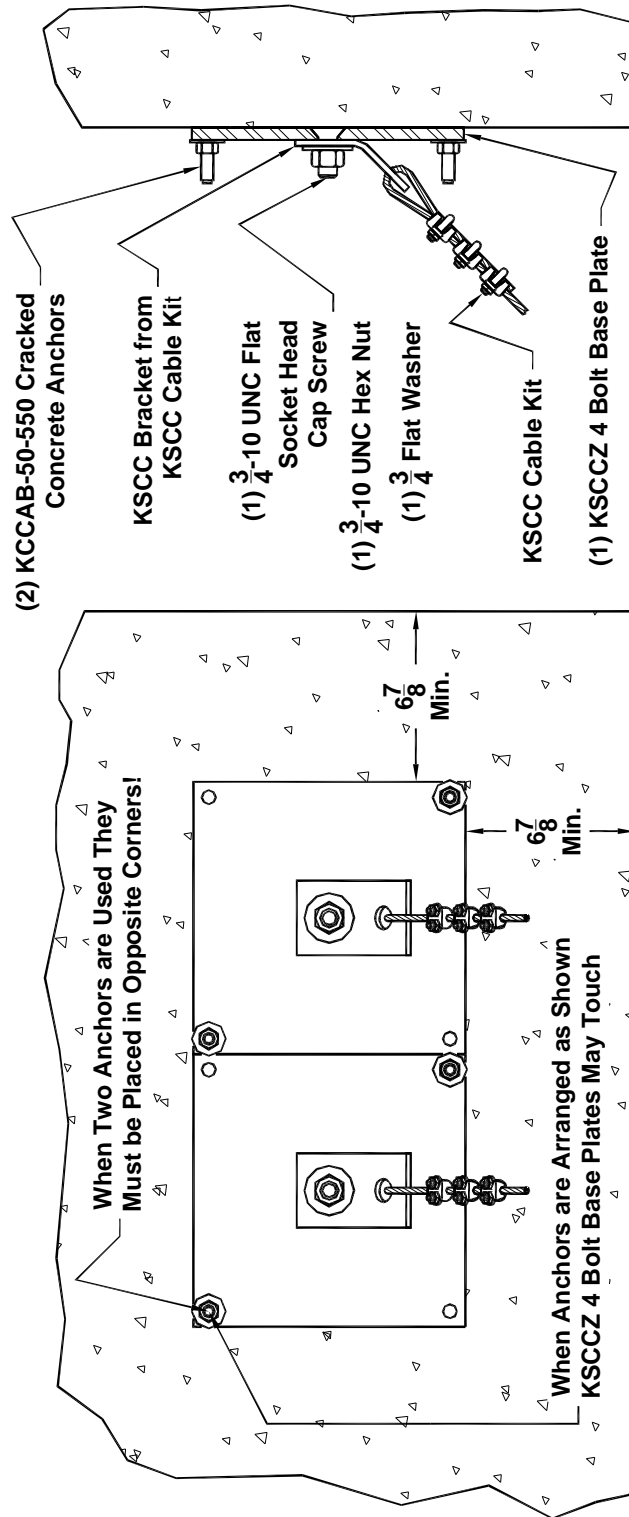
; Model KSCCZ2 Attachment Kit to Concrete Using the KSCC Brackets – (2) 1/2 Anchors
